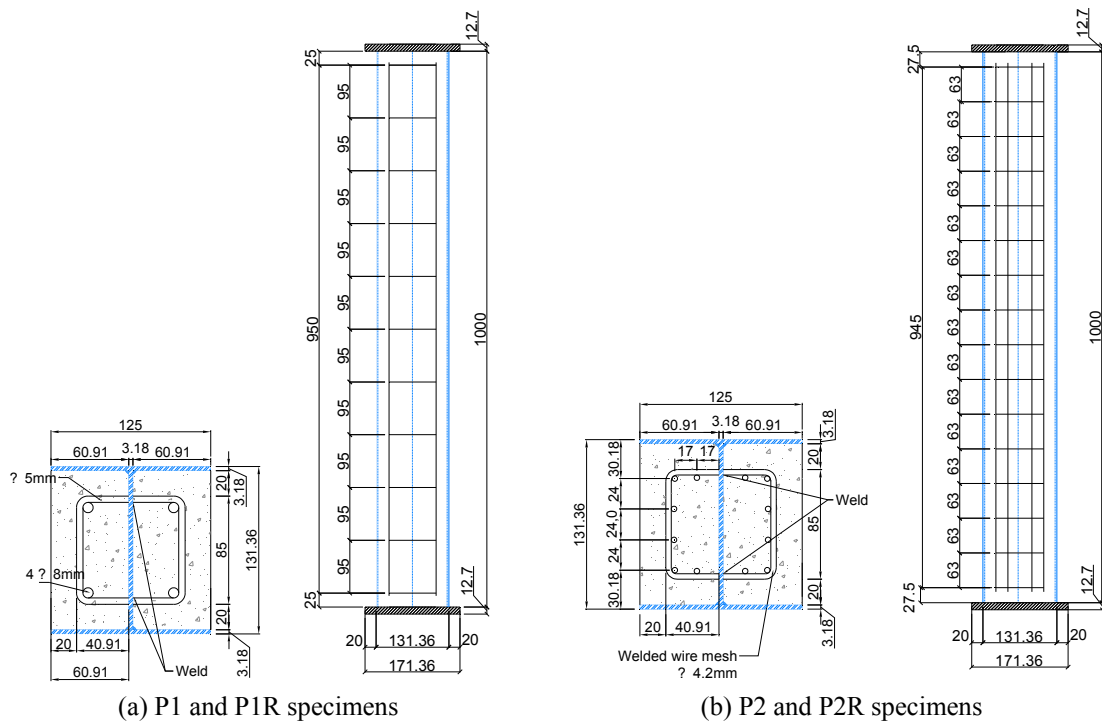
Geometrical characteristics of specimens (Units: mm)
